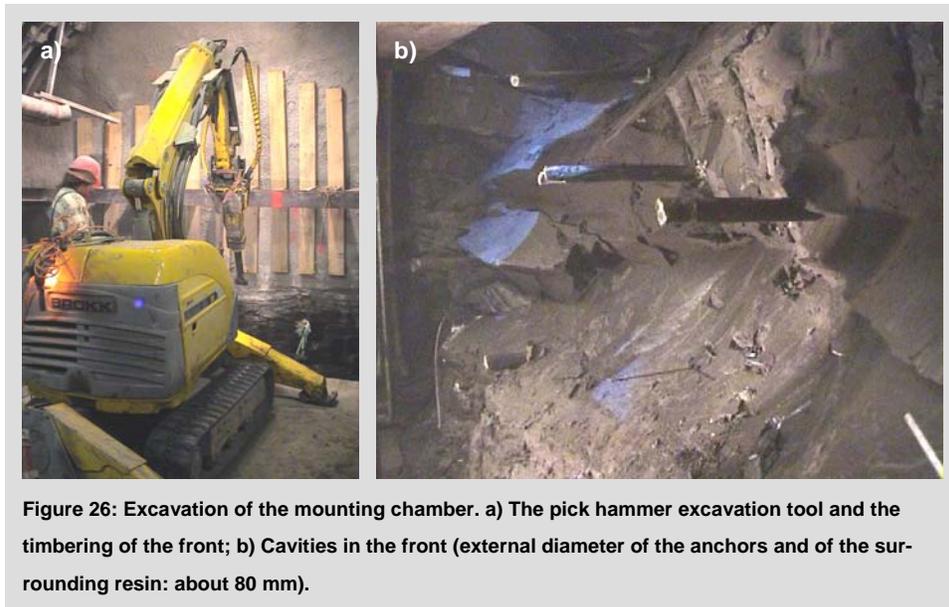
Excavation of the mounting chamber. a) The pick hammer excavation tool and the timbering of the front; b) Cavities in the front (external diameter of the anchors and of the surrounding resin: about 80 mm).
